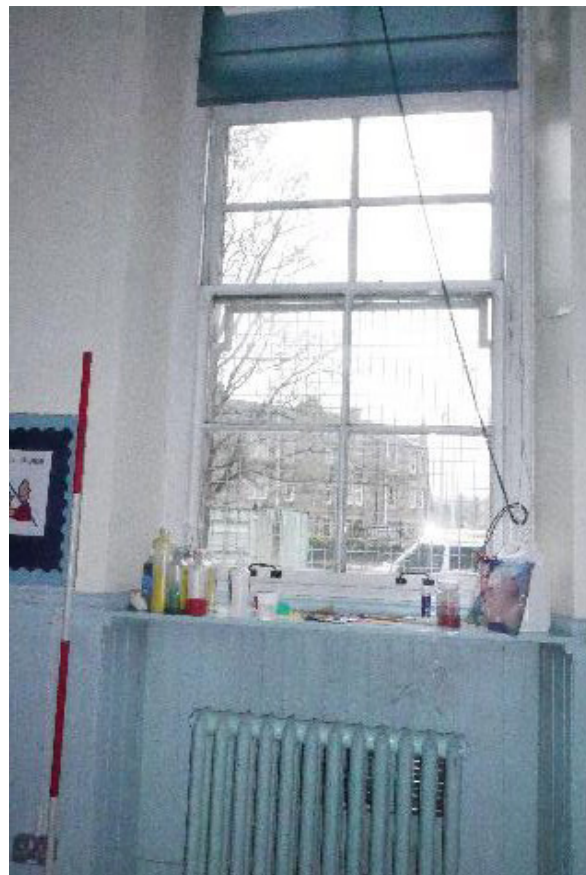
Detailed view of the window opening in the south-west wall of Room 0/5 (© Derek Hall 2023)
